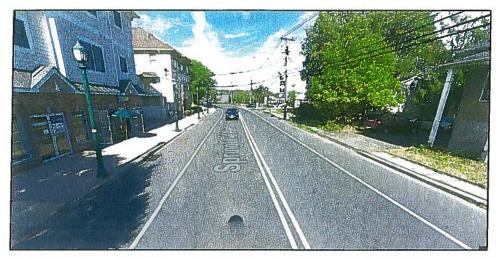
Figure C: Existing brick pavers on the left side of the street, but absent from the right side.
